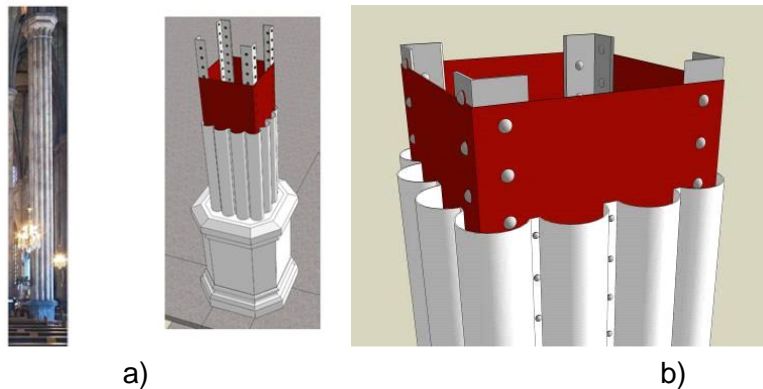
Interior columns: a) photo of a column; b) drawing showing the interior of the columns.
